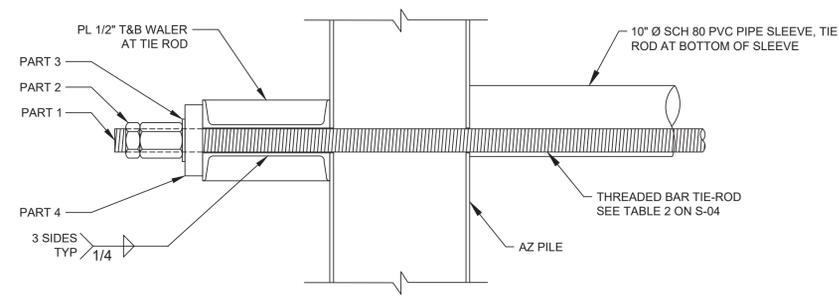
CORNER CONNECTOR ALTERNATIVE A
